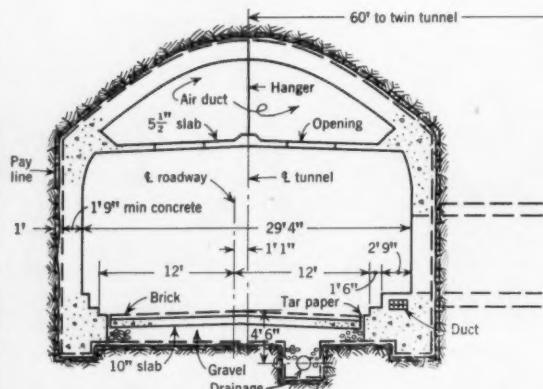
Section through one of the Fort Pitt Tunnels. These tunnels will speed traffic from the east and south into Pittsburgh's Golden Triangle.
